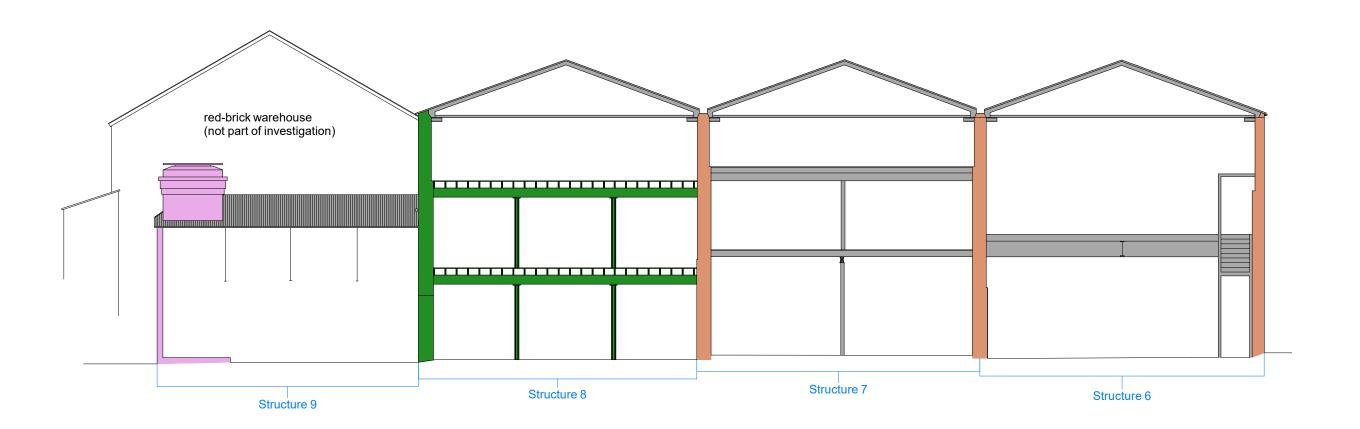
Section through Structures 6-9, showing floor levels and phasing.
